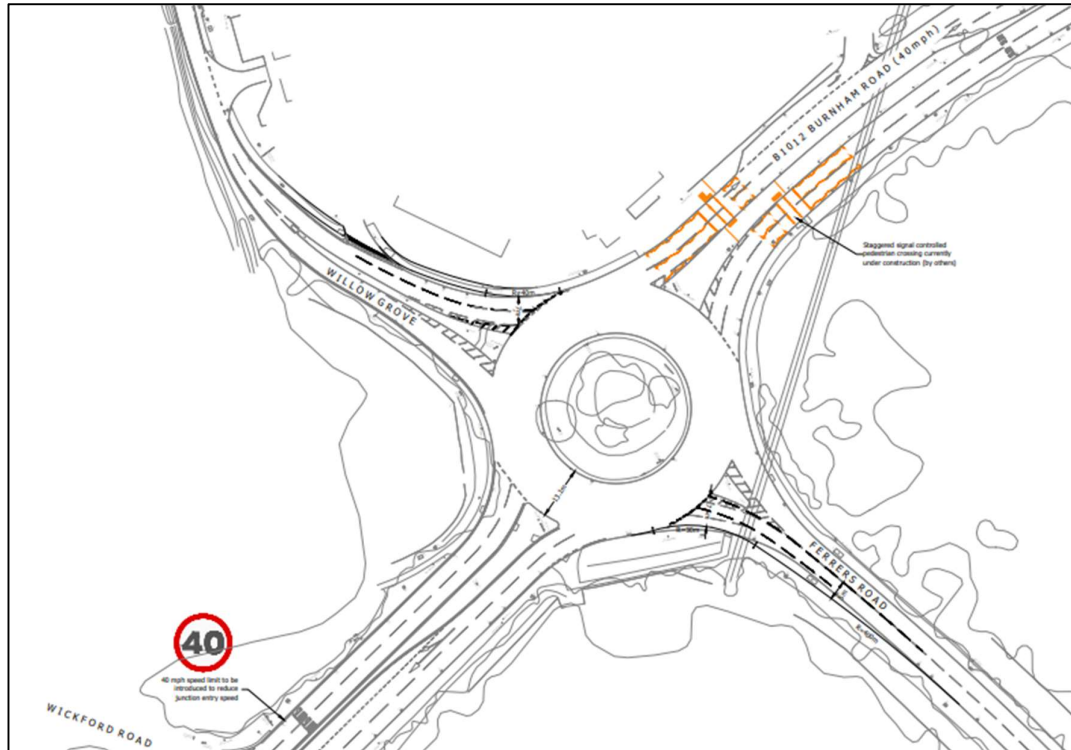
A132 Burnham Road/Ferrers Road/Willow Grove Junction Possible upgrades to the Willow Grove and Ferrers Road Roundabout Arms
